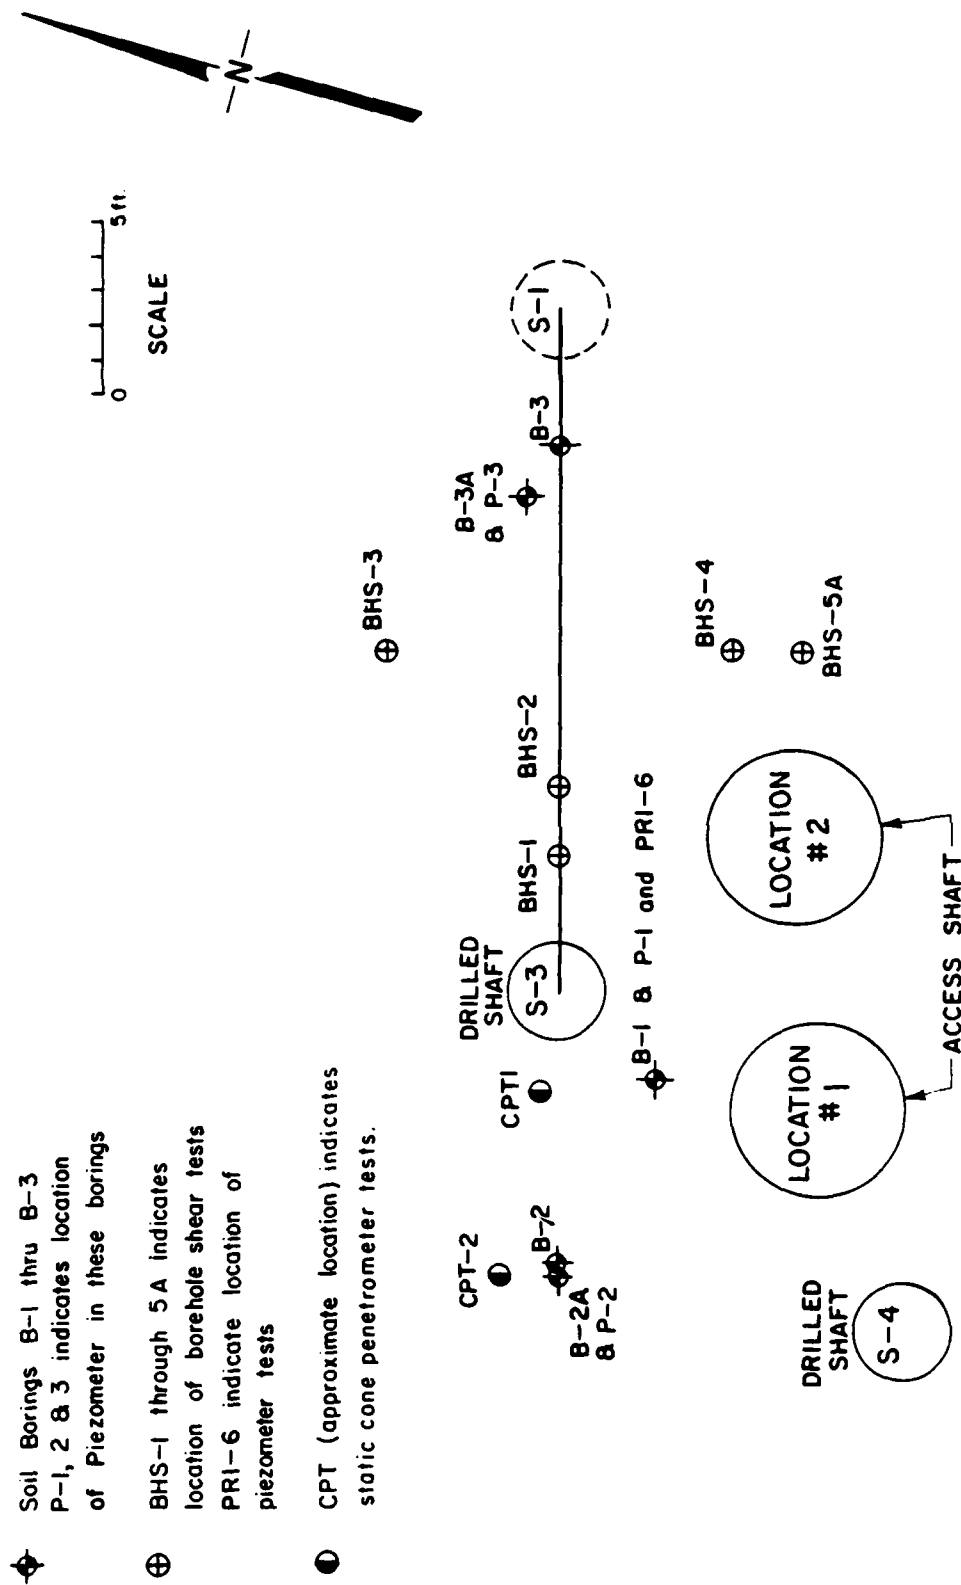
PLOT PLAN OF SOIL BORING LOCATION AT TEST SITE, HOUSTON, TEXAS
